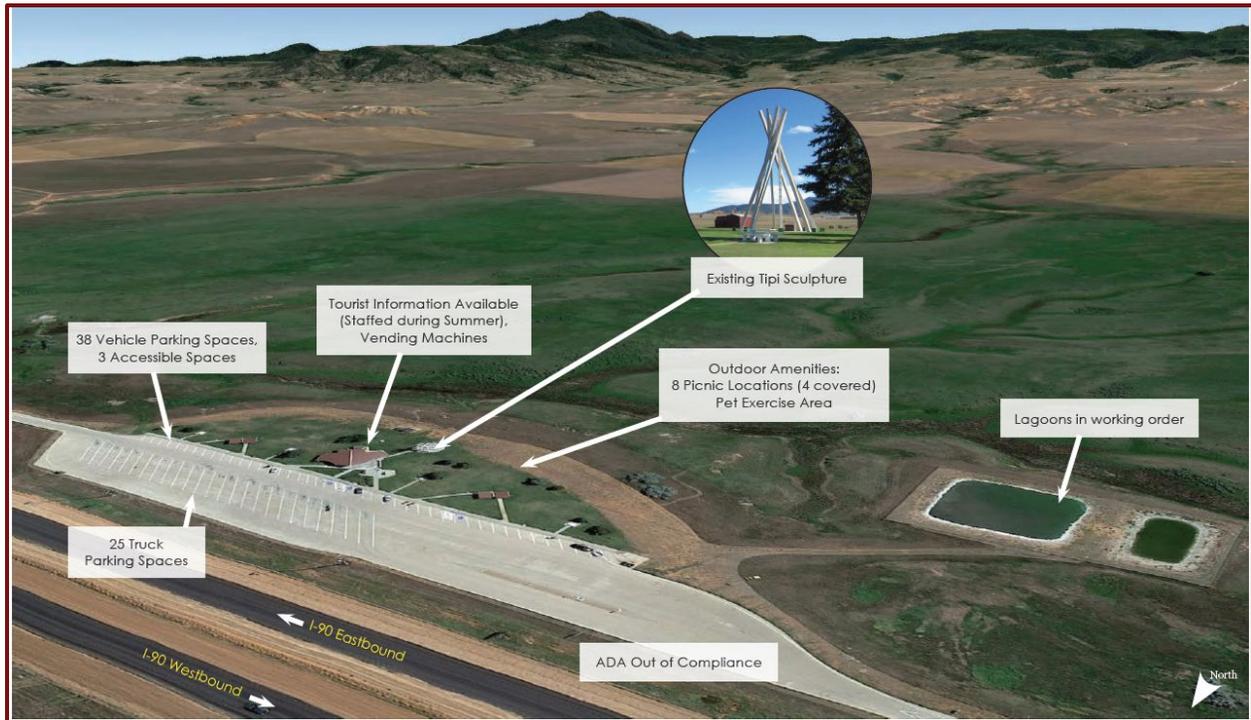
Site details at the Existing Rest Area Location (MM 1)
